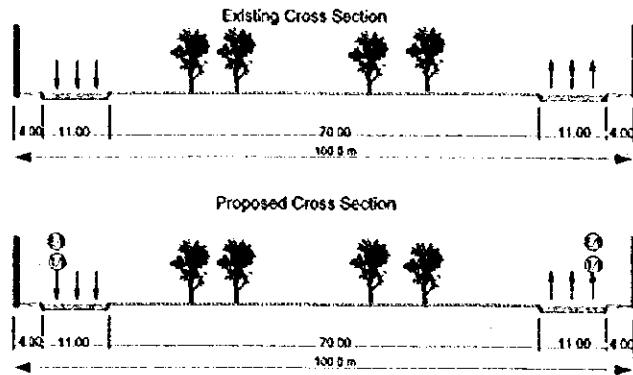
Typical Cross Section on Autopista Norte (1)
